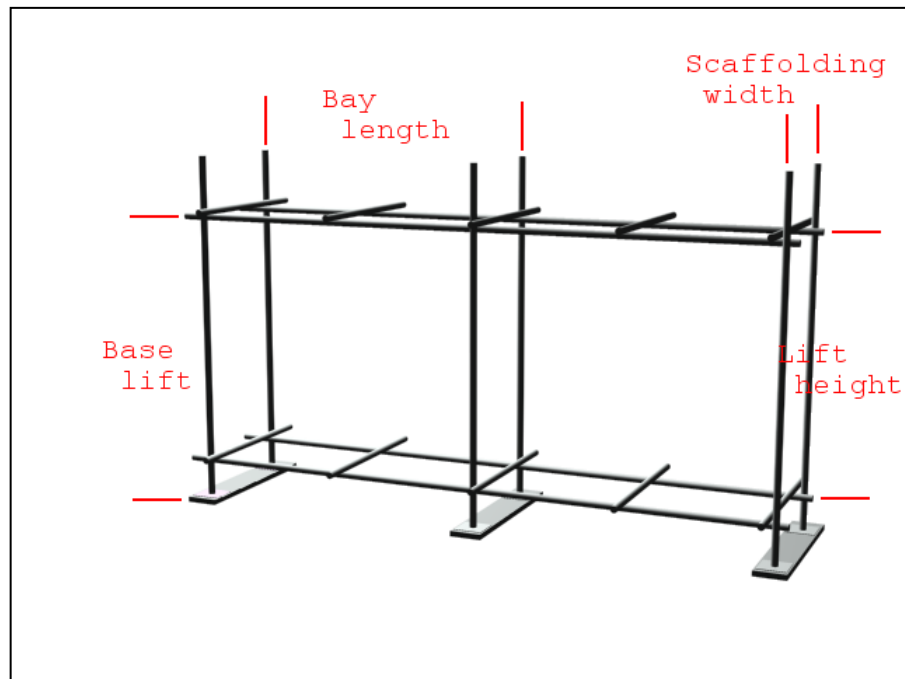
Basic Scaffolding term without board, bracing and coupler
